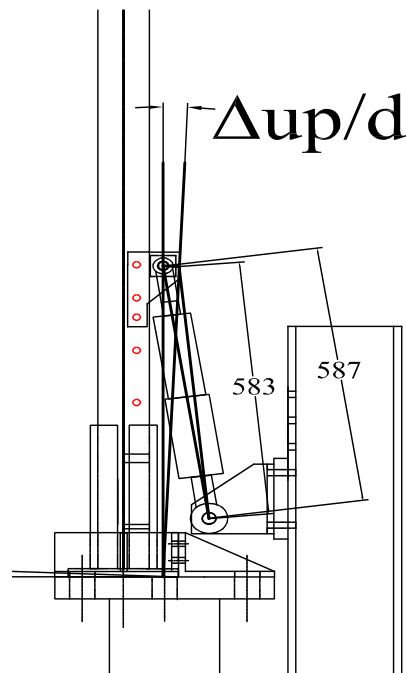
Damper Stroke Resulting from Rotation of Compressed Pier Leg
